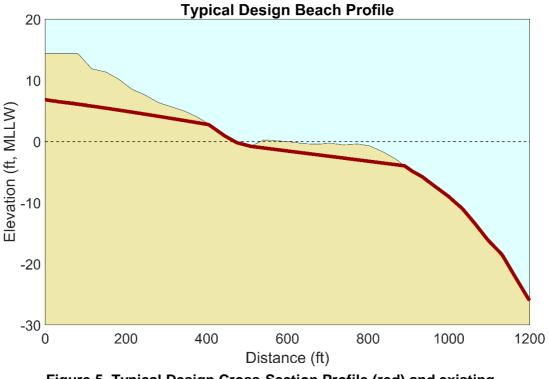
Typical Design Cross-Section Profile (red) and existing ground (brown)
